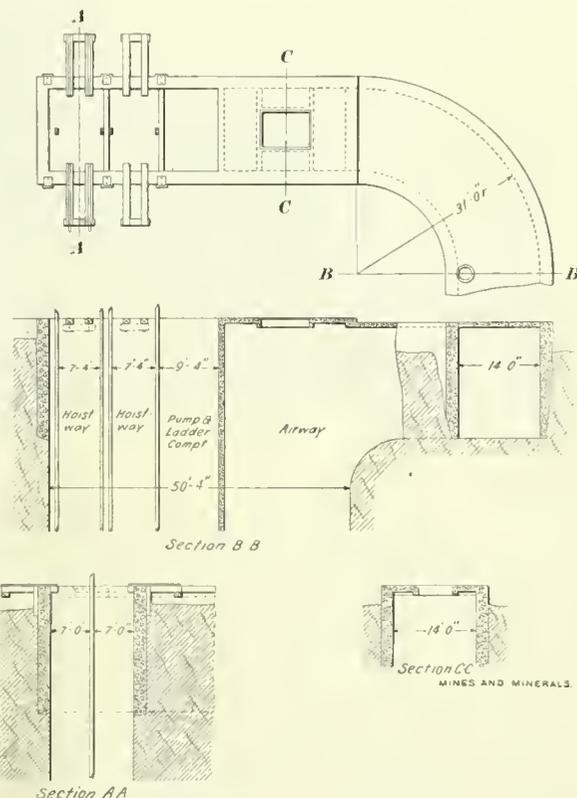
PLAN AND SECTION OF AIRWAY, LOOMIS SHAFT
